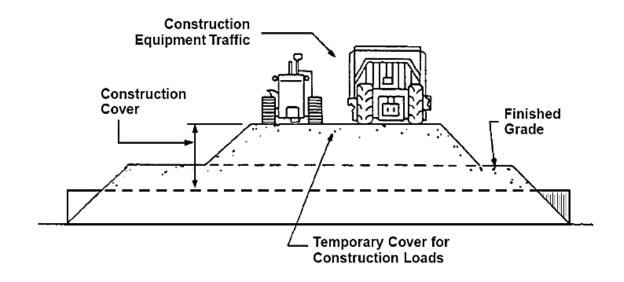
Temporary Cover for Construction Loads (UDOT 2008)
